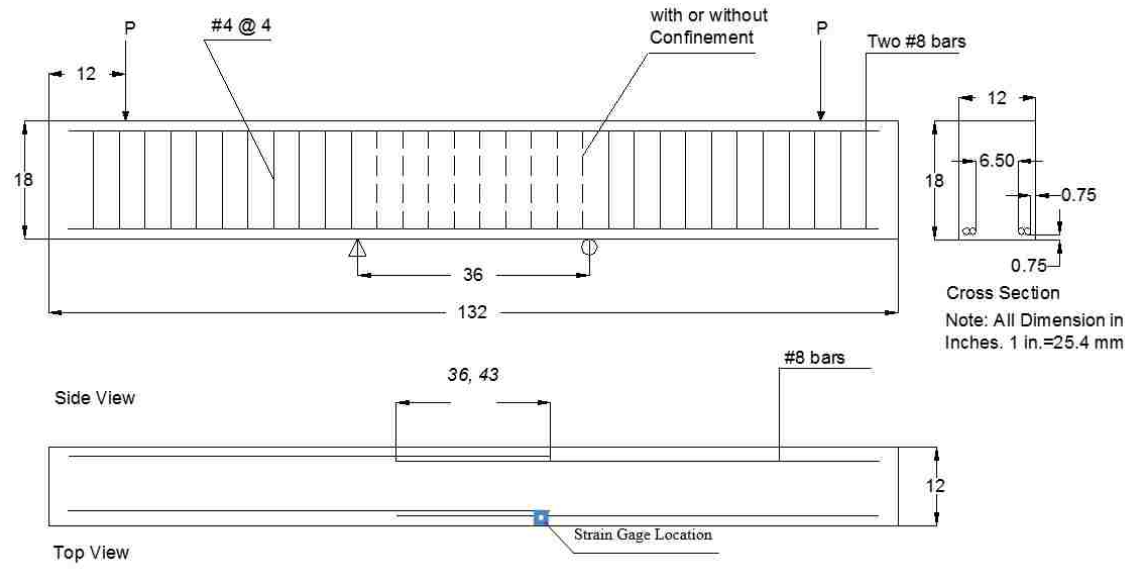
Details of Beam Specimens with No. 25 (#8) Rebar Splices
